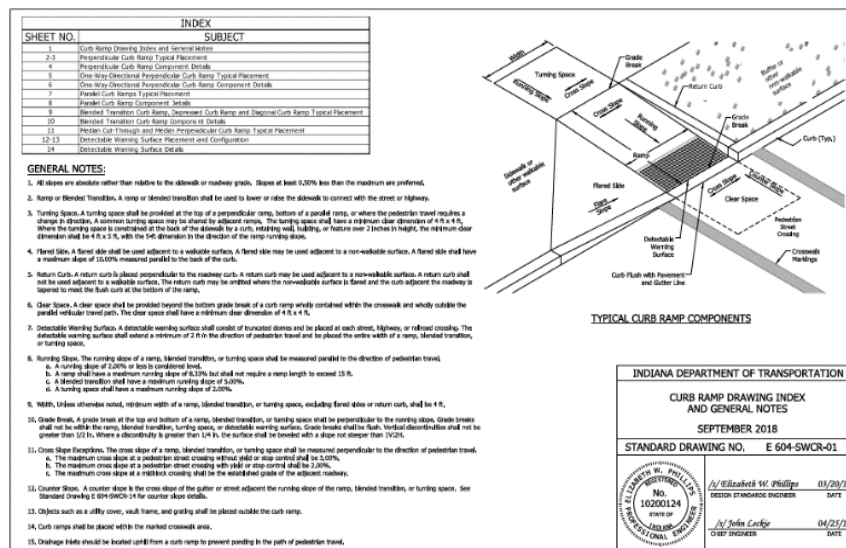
Curb Ramp Drawing Index and General Notes (E 604-SWCR-01)
